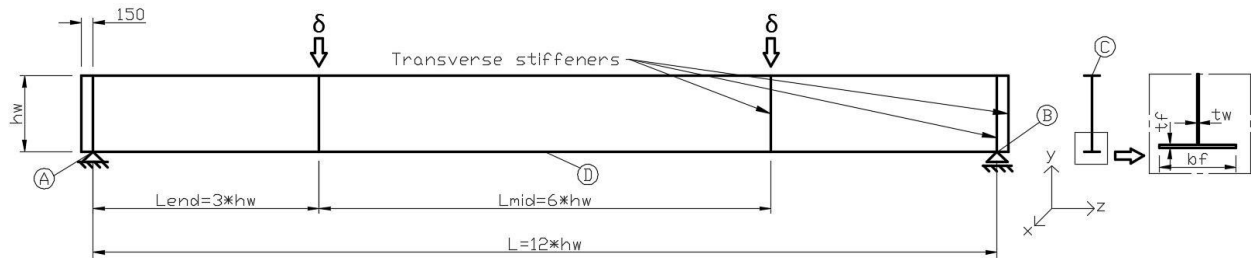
OVERALL LAYOUT OF THE PLATE GIRDERS TESTED ON BENDING
